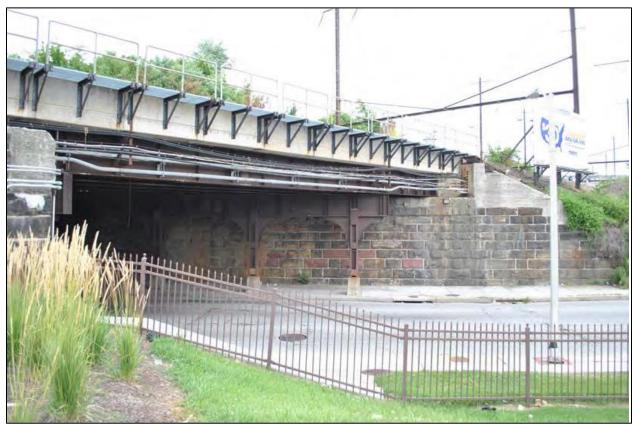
View looking north at the bridge over West Franklin Street, showing the stone abutment and wingwalls. The new bridge will be located to the west, which is to the left in this photo.
